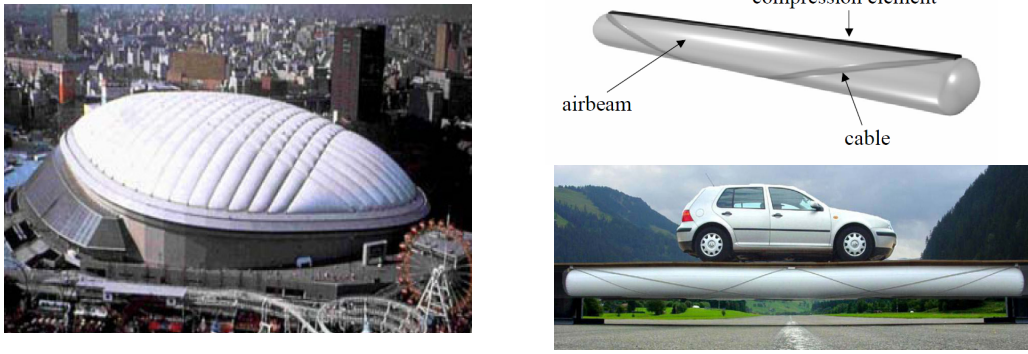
a) Air-supported structure: Tokyo 'Big Egg' dome, b) Tensairity girder by Airlight company
